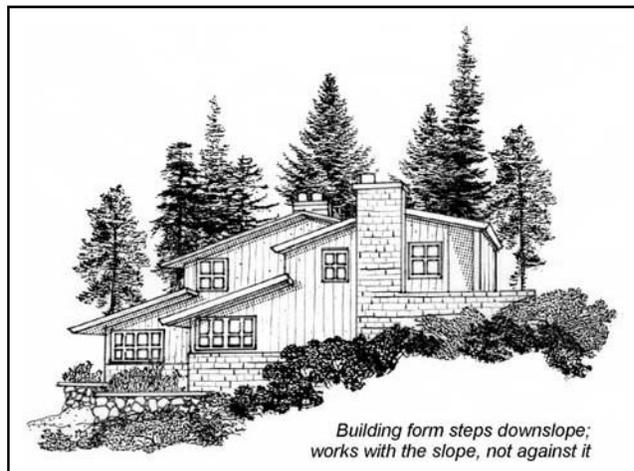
Design Sensitive to Terrain (an example of building form, not intended to show preferred architectural style)
